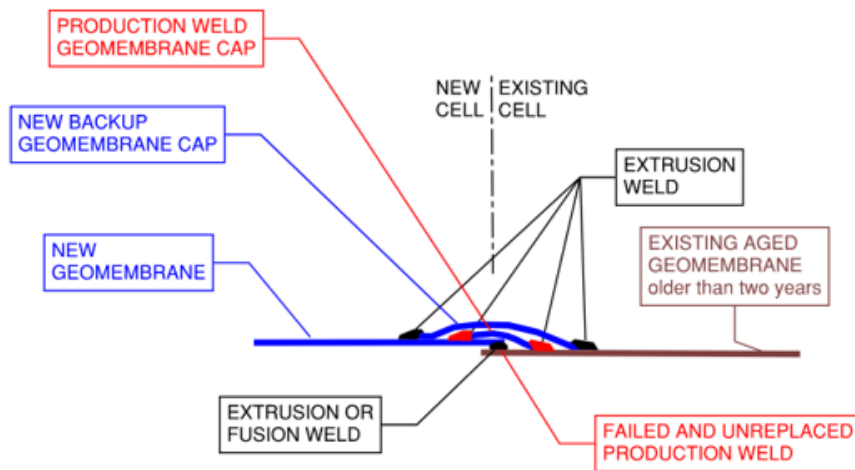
Location of Production Weld Geomembrane Cap
